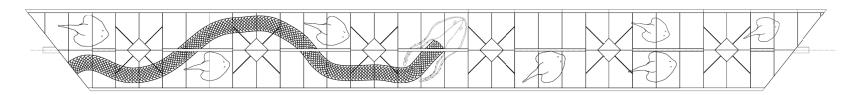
CULTURAL ARTWORK AT KURNELL - REFLECTED CEILING PLAN
